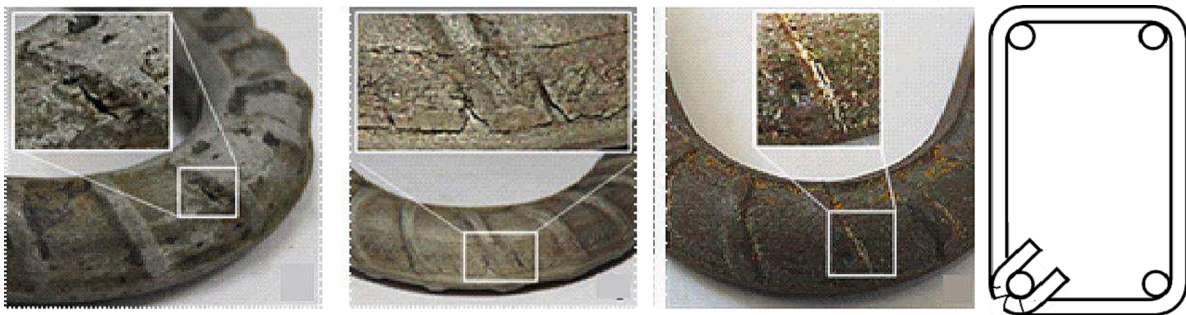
Critical failure conditions showing (a-c) Cracks formed during bend test, and (b) schematic showing the potential location in real-time stirrups under excess bending.
